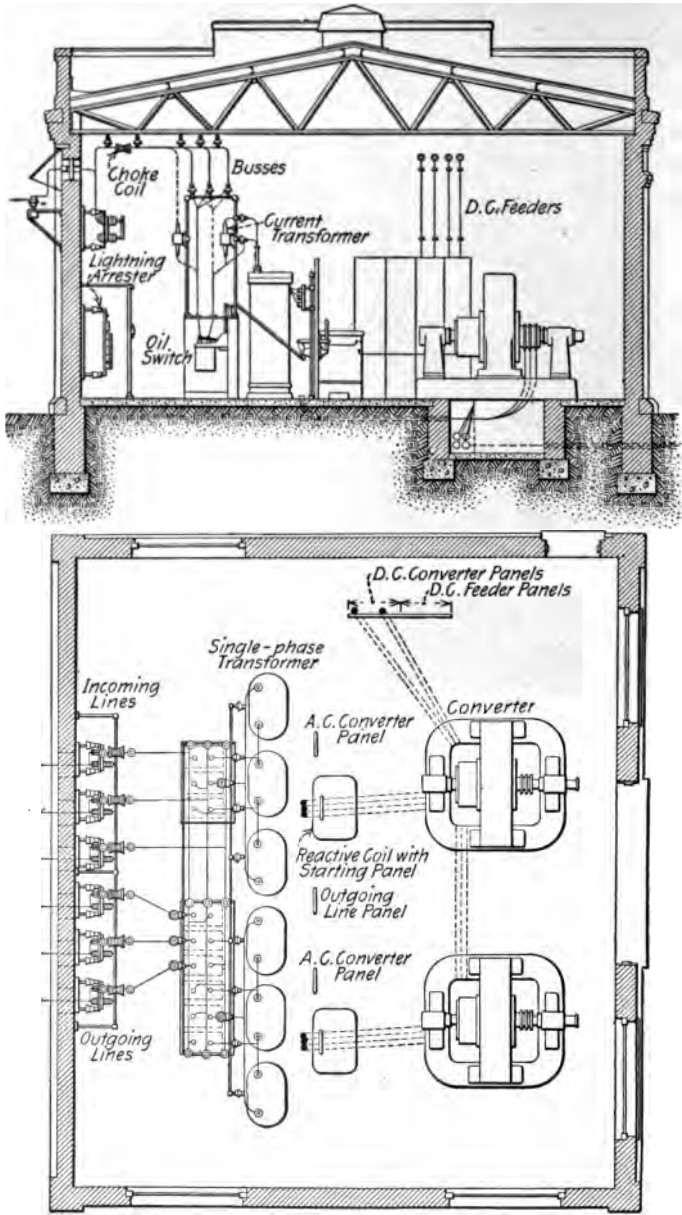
Typical Substation Arrangement with Feeders entering Overhead,—Elevation and Plan.
